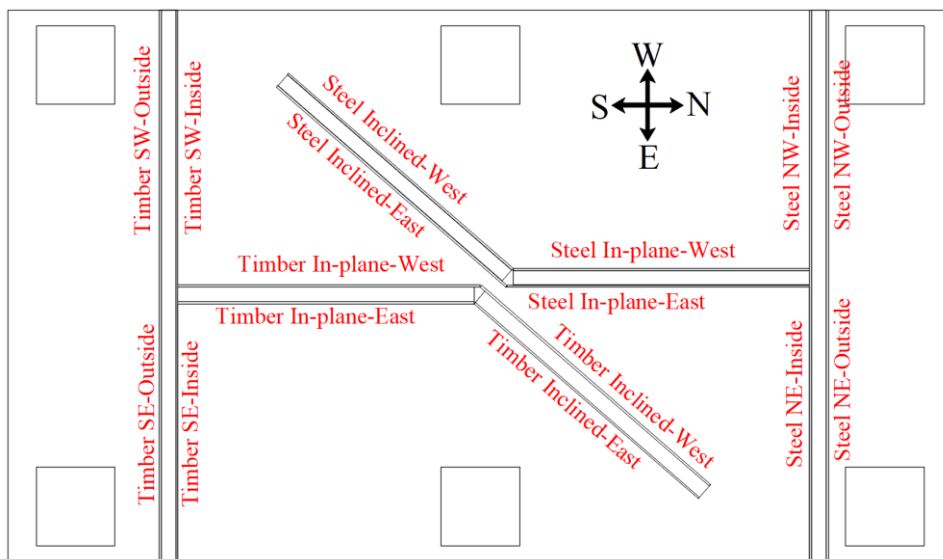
Wall nomenclature based on their wall frame and location on plan
